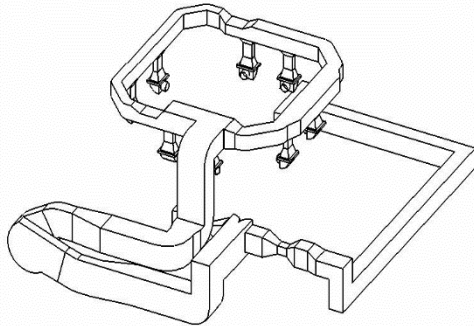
Westover 13's Installed Fan Boosted Over-fire Air System Fan & Ductwork Arrangement
